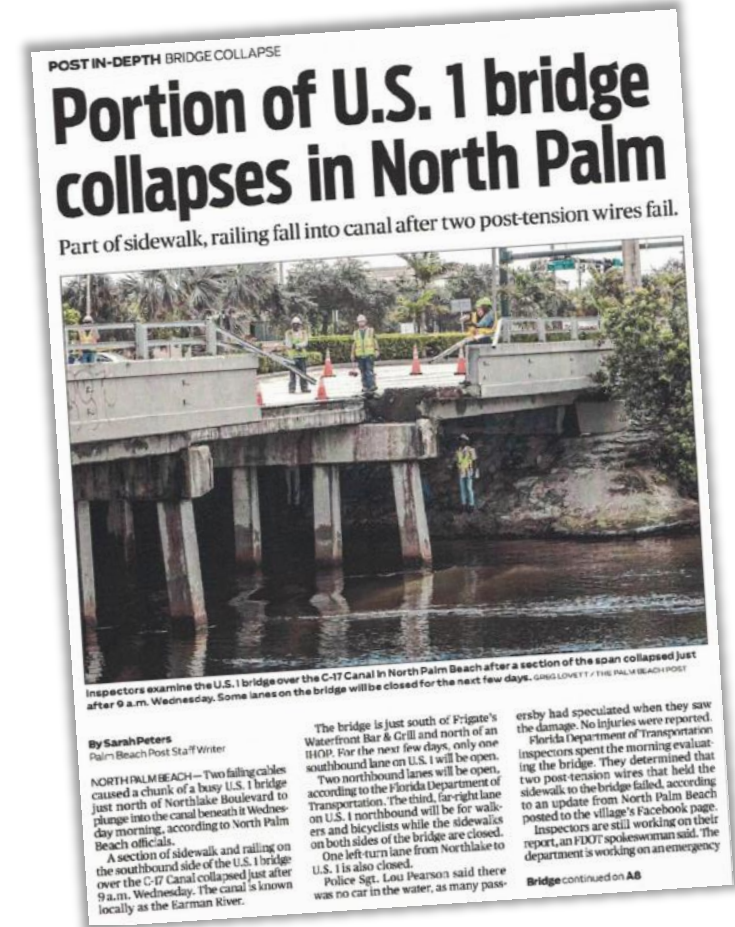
from: *Corrosion Mechanism in Reinforced Concrete
